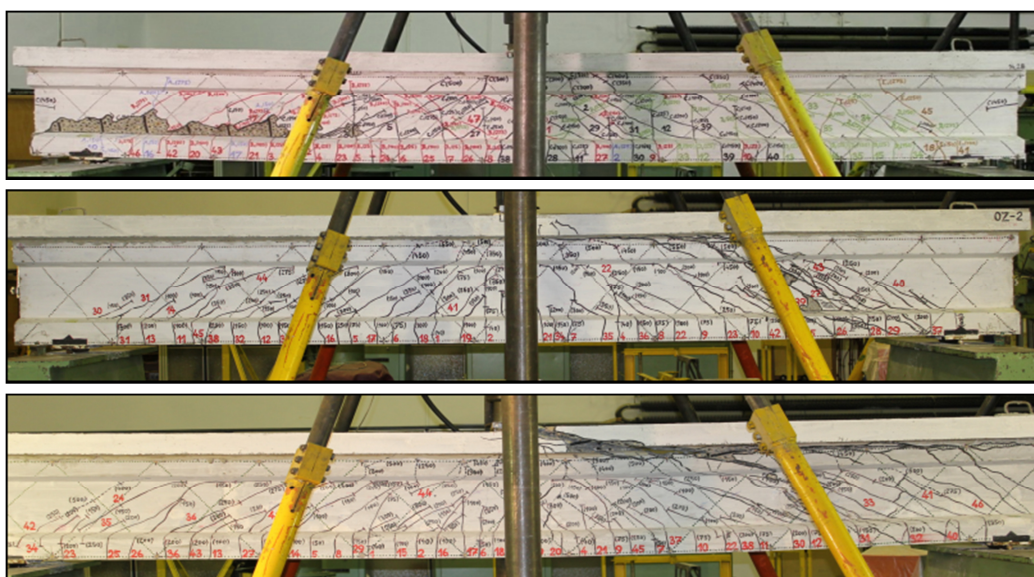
Way of failure – strengthened beams ST, OZ, ZP.
